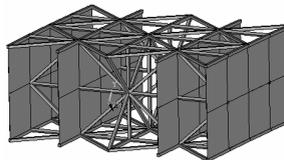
3-D FE model of a segment of the embedded scaffolding in the trial design bridge
